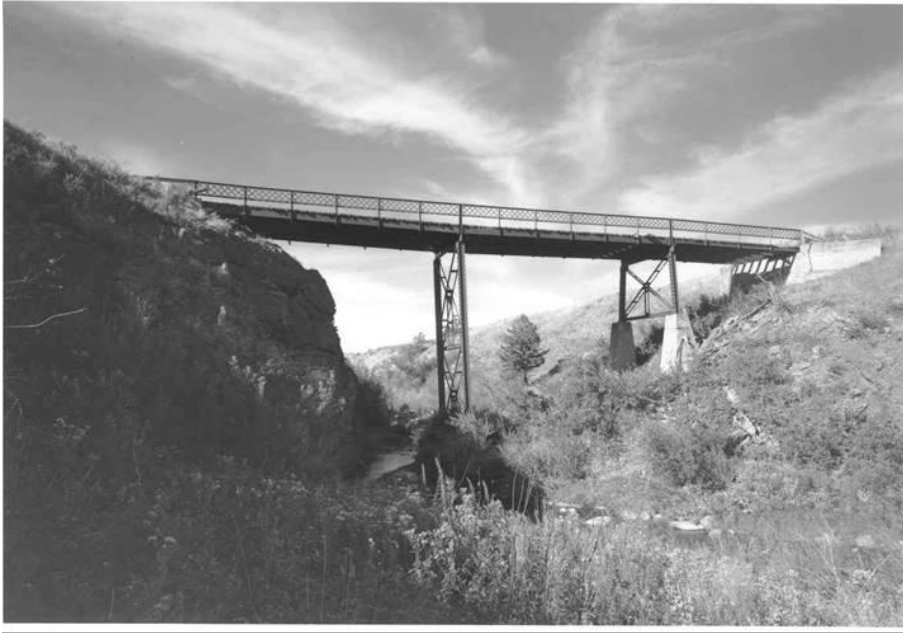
Shonkin Creek Bridge. South profile. View to the northeast
